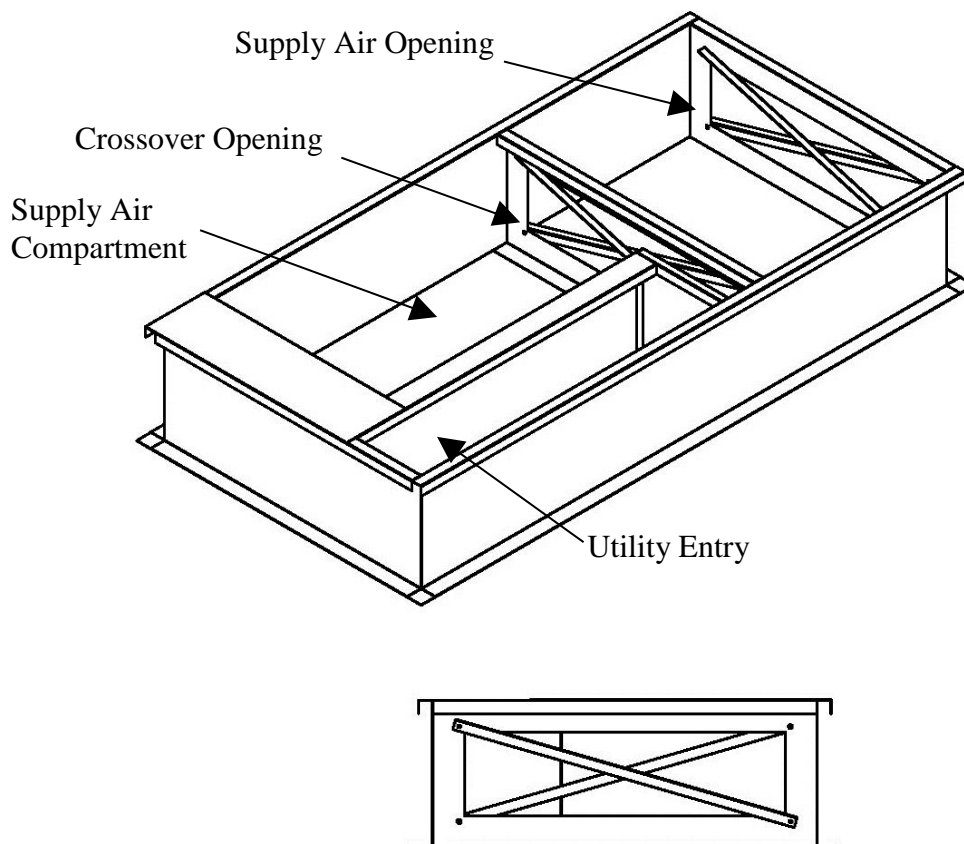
Acoustical Solid Bottom Curb with Horizontal Discharge Openings
